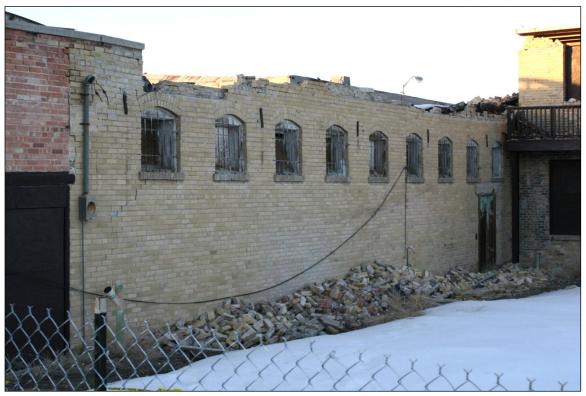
Fallen parapet at the back of the Murphy's Bar.
